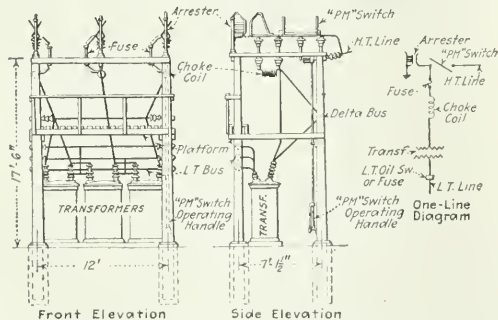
TYPICAL SINGLE-CIRCUIT OUTDOOR SUBSTATION WITH LARGE CAPACITY TRANSFORMERS AT GROUND LEVEL
